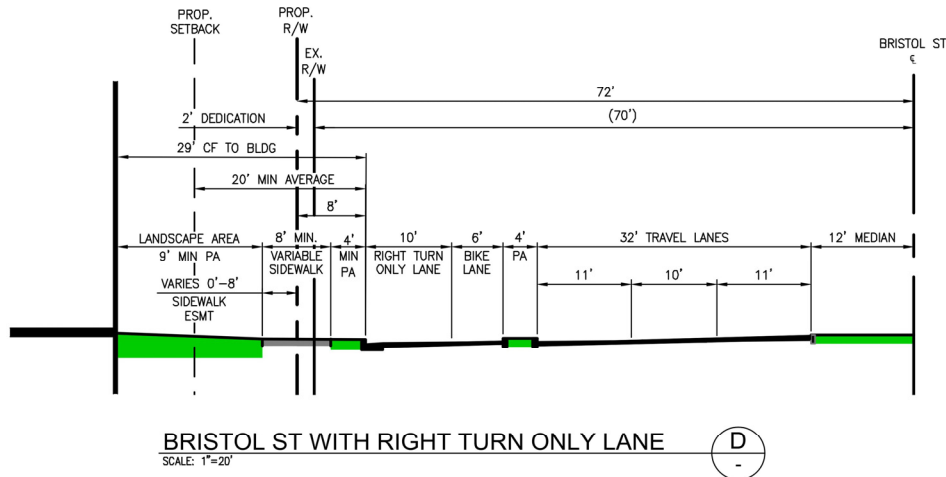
Street Cross Sections – Bristol and Sunflower
